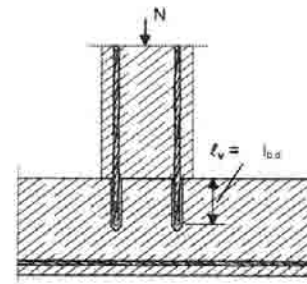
Rebar connection for components stressed primarily in compression. The rebars are stressed in compression
